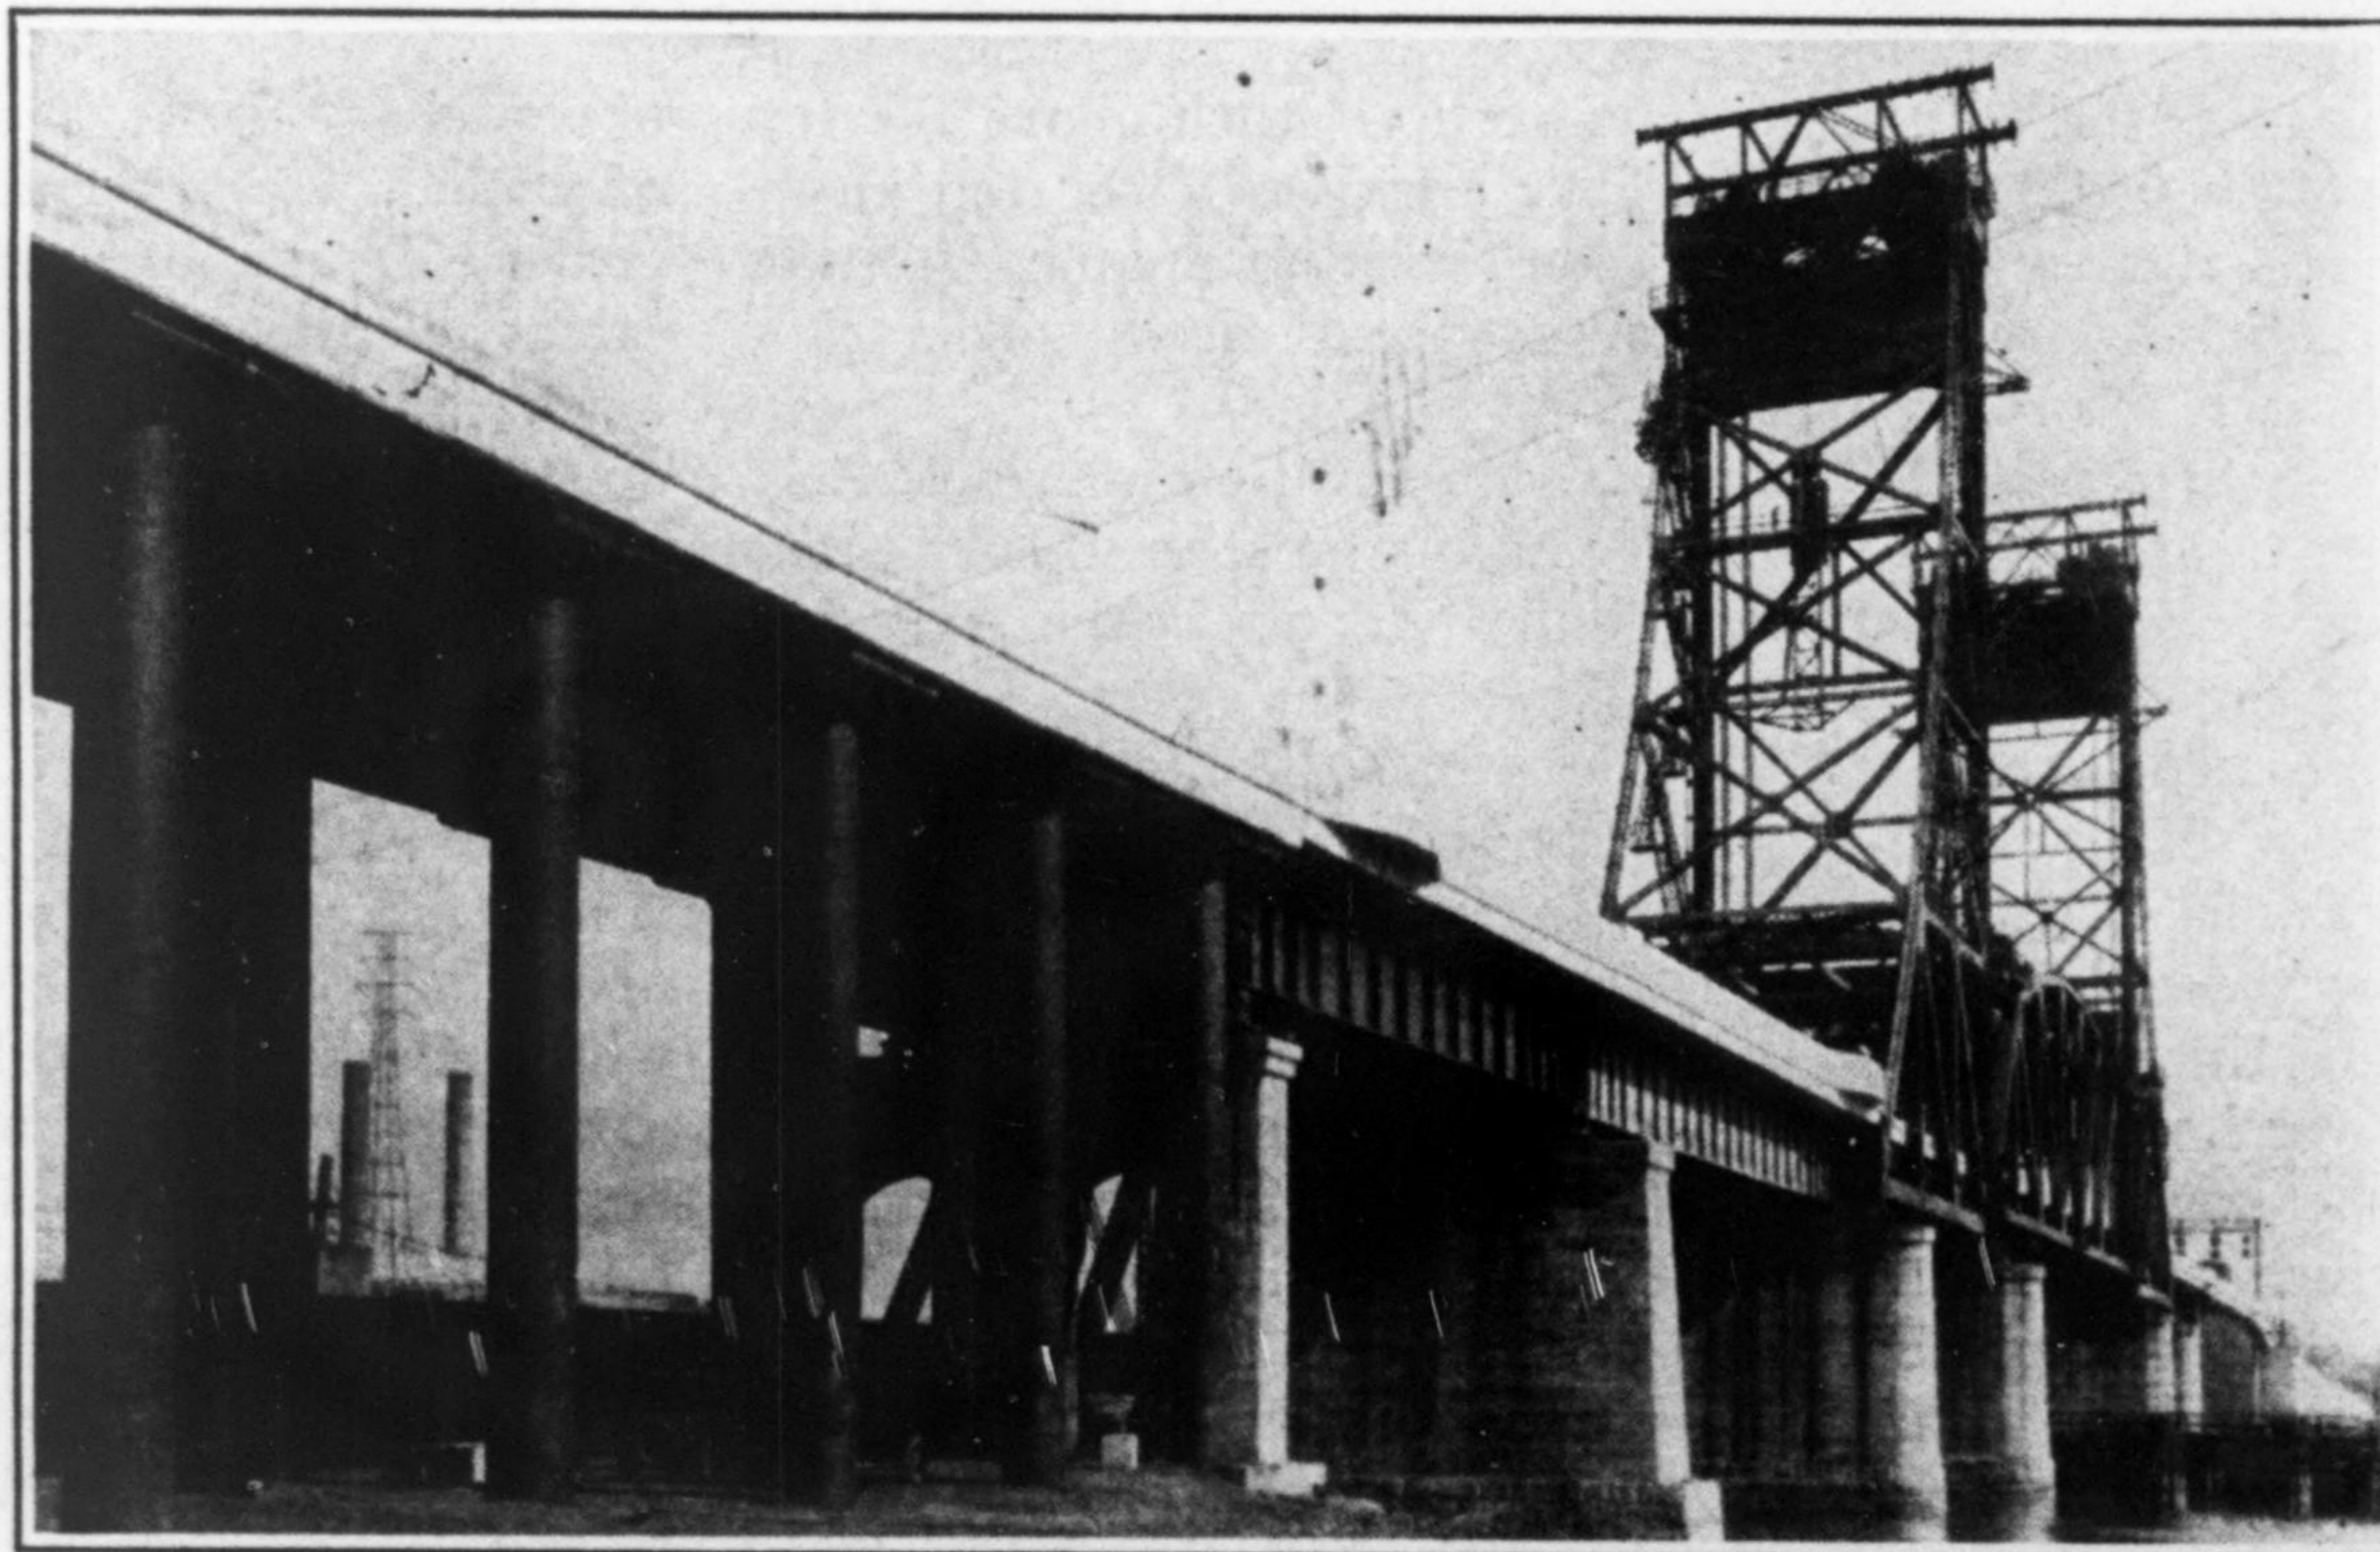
WEST APPROACH VIADUCT AND GIRDER SPANS
